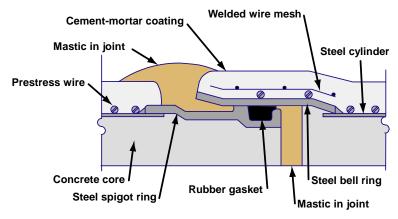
Prestressed concrete cylinder pipe (PCCP) details (embedded cylinder).
